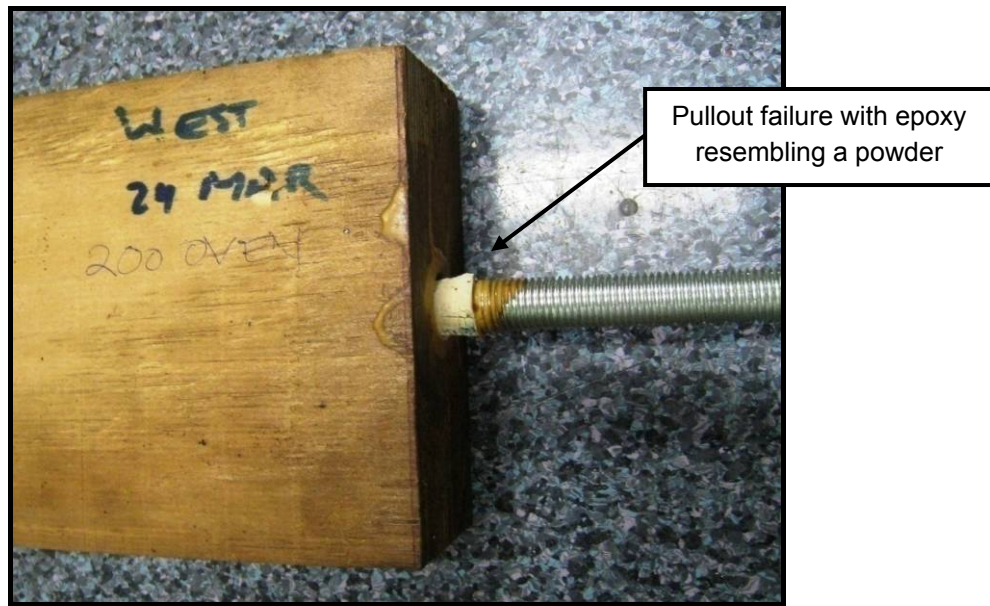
Mode 2 Failure in Timberlinx 50°C Oven Specimen
